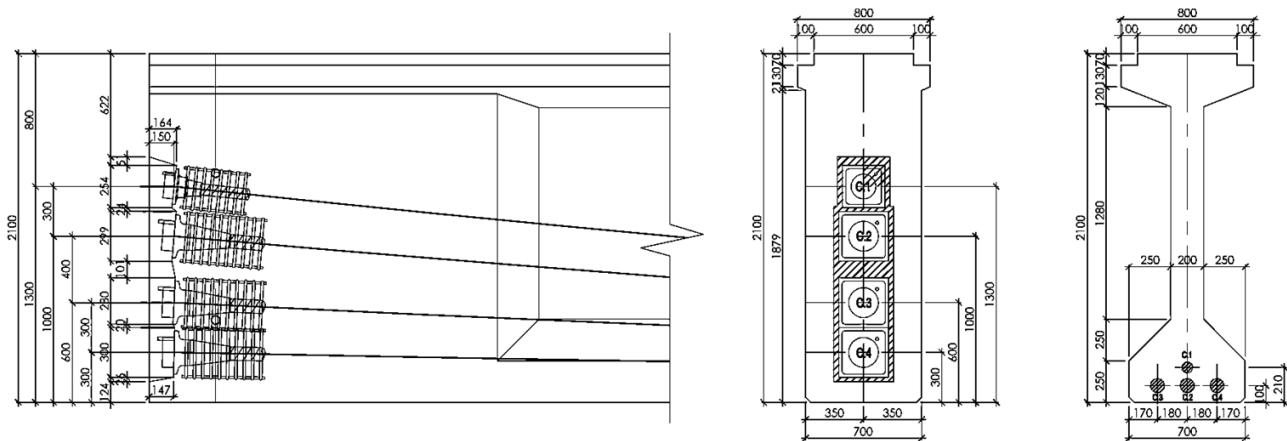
Prestressing steel configuration and cross-section of the beam.
